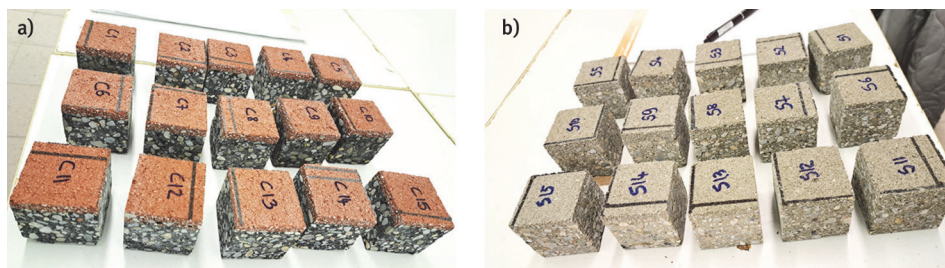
Cut-out cubic specimens: (a) SDC-SSA1 concrete, (b) SDC-R concrete
